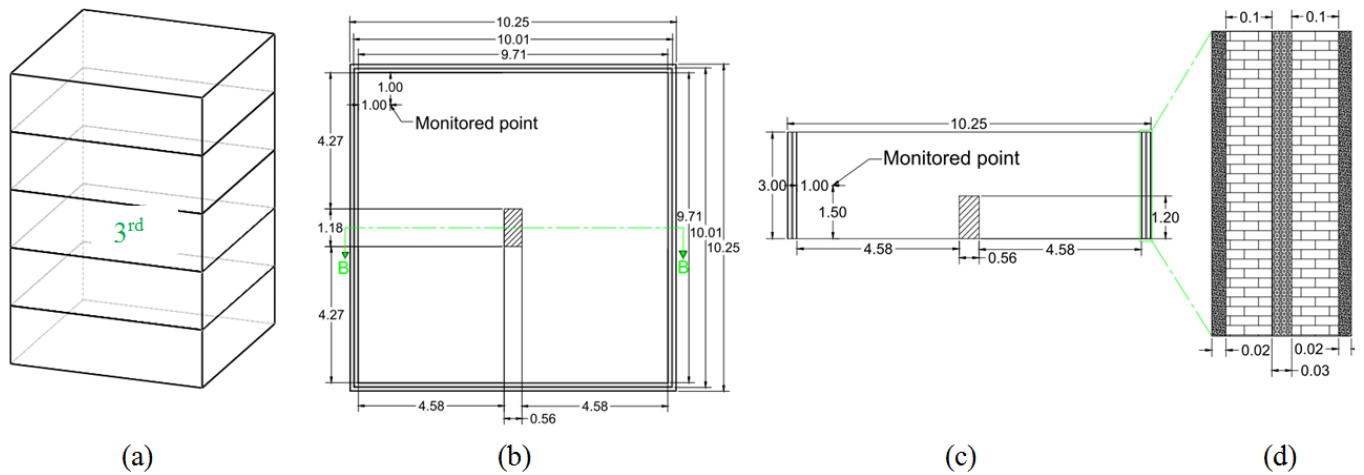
Schematic representations of the simulated model: (a) location of the studied floor in the building; (b) Plan view; (c) Section view B-B; (d) details of the walls from exterior to the interior (REFM; brick; extruded polystyrene (XPS); brick; REFM or HPCMM). Units: [m].
